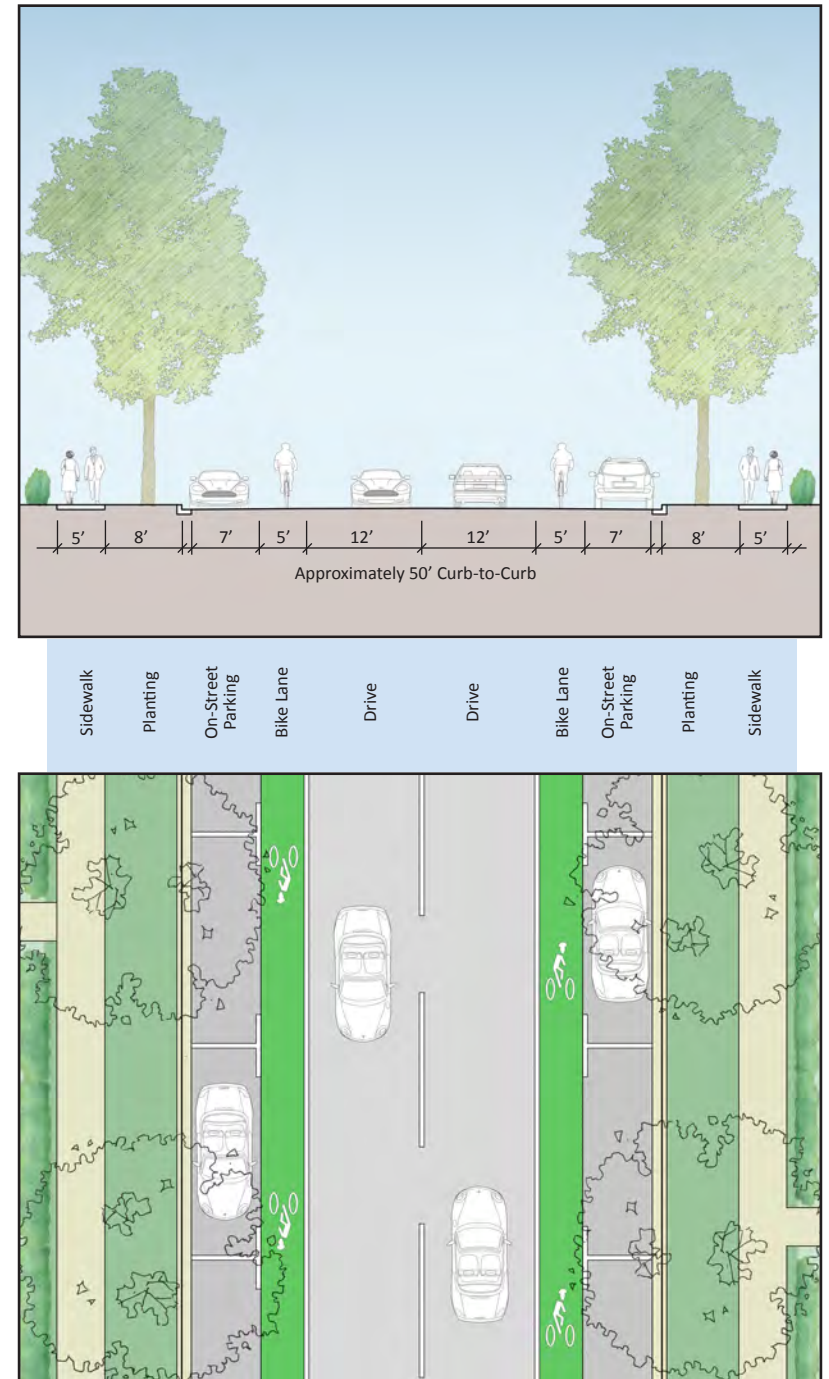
Street Sections – Illustrative Typical Section of Grace Street
